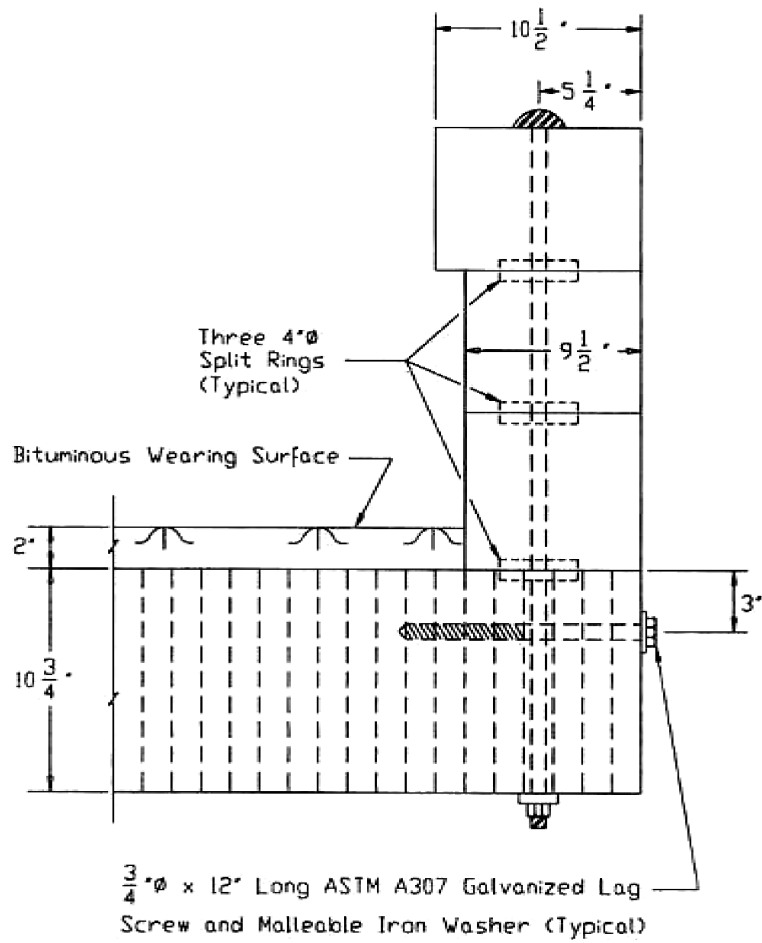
Cross section of rail and scupper blocks used in original curb-type railing.
